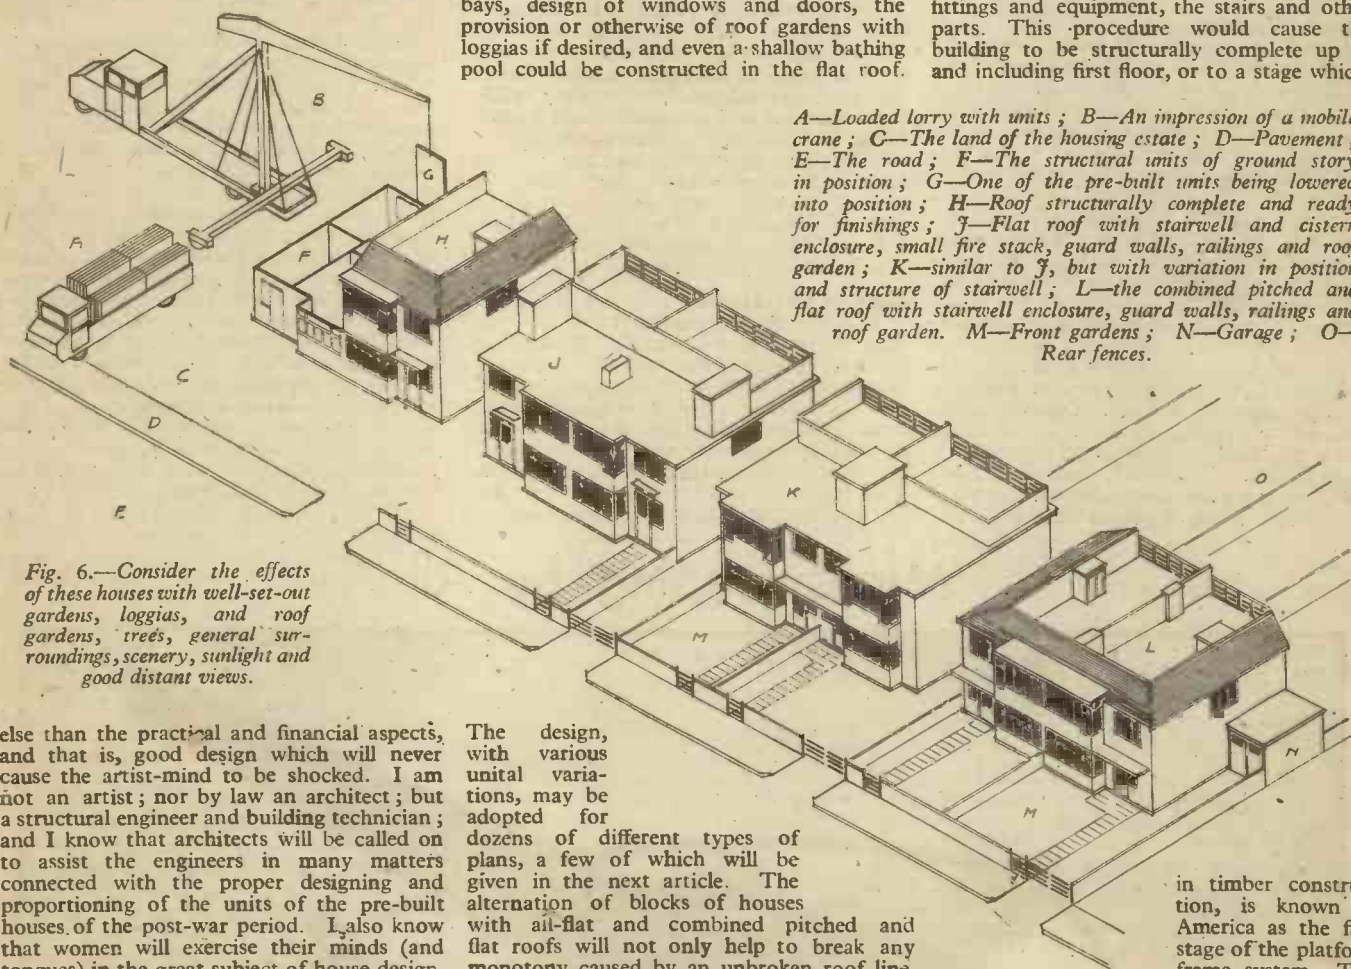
Consider the effects of these houses with well-set-out gardens, loggias, and roof gardens, trees, general surroundings, scenery, sunlight and good distant views.
